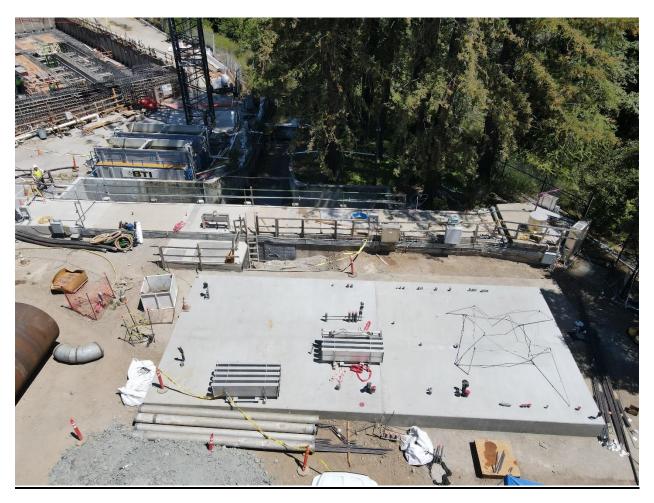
Aerial view of the completed foundation for the Los Altos Power Building (LAPB).
